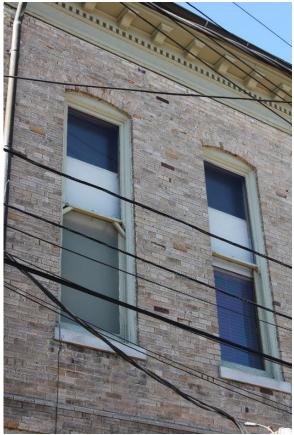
, Wallace Library, East elevation, detail of first and second floor windows.
